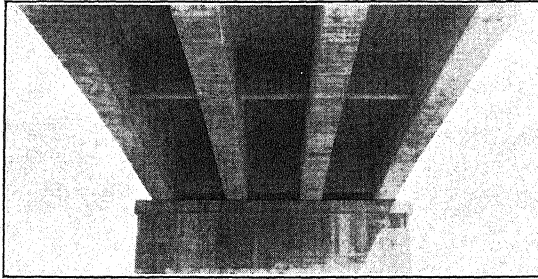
Arrangement of Girders on Pier. (See p. 46.)
